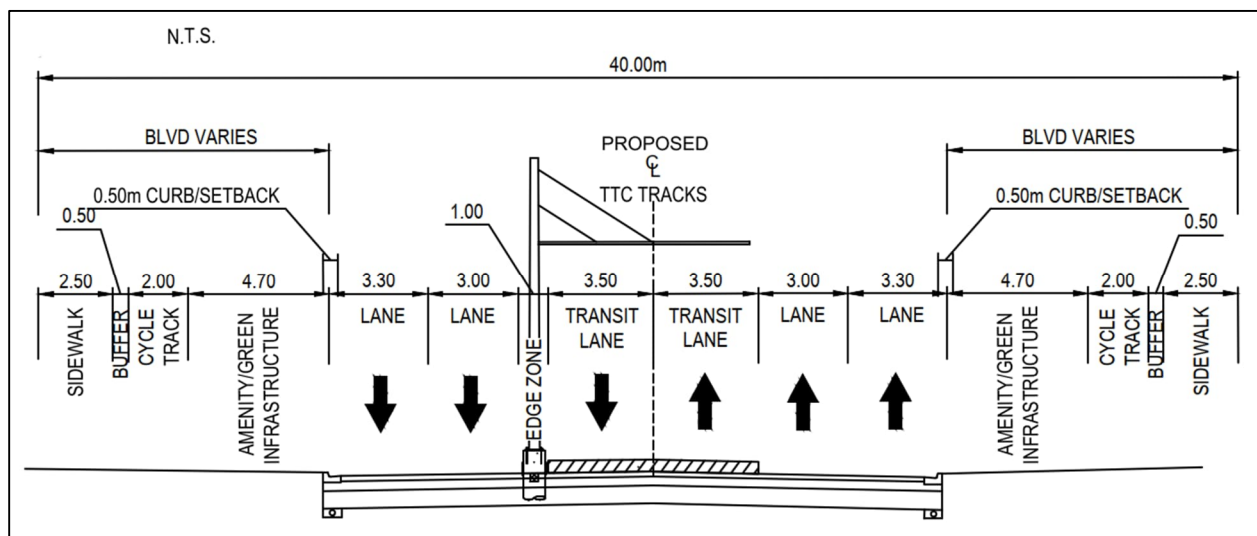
Lake Shore Boulevard West Improvements at Mimico Creek Bridge – Typical Concept Cross-section
